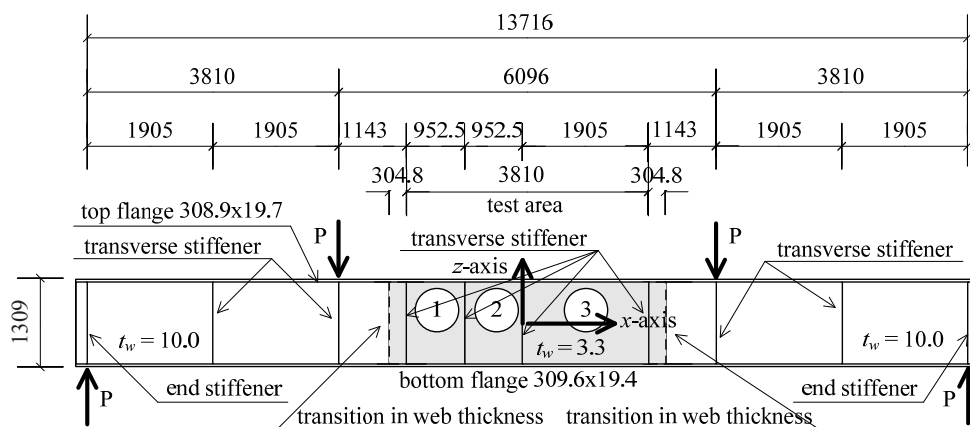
Geometry of test specimen G4 (dimensions in mm)
